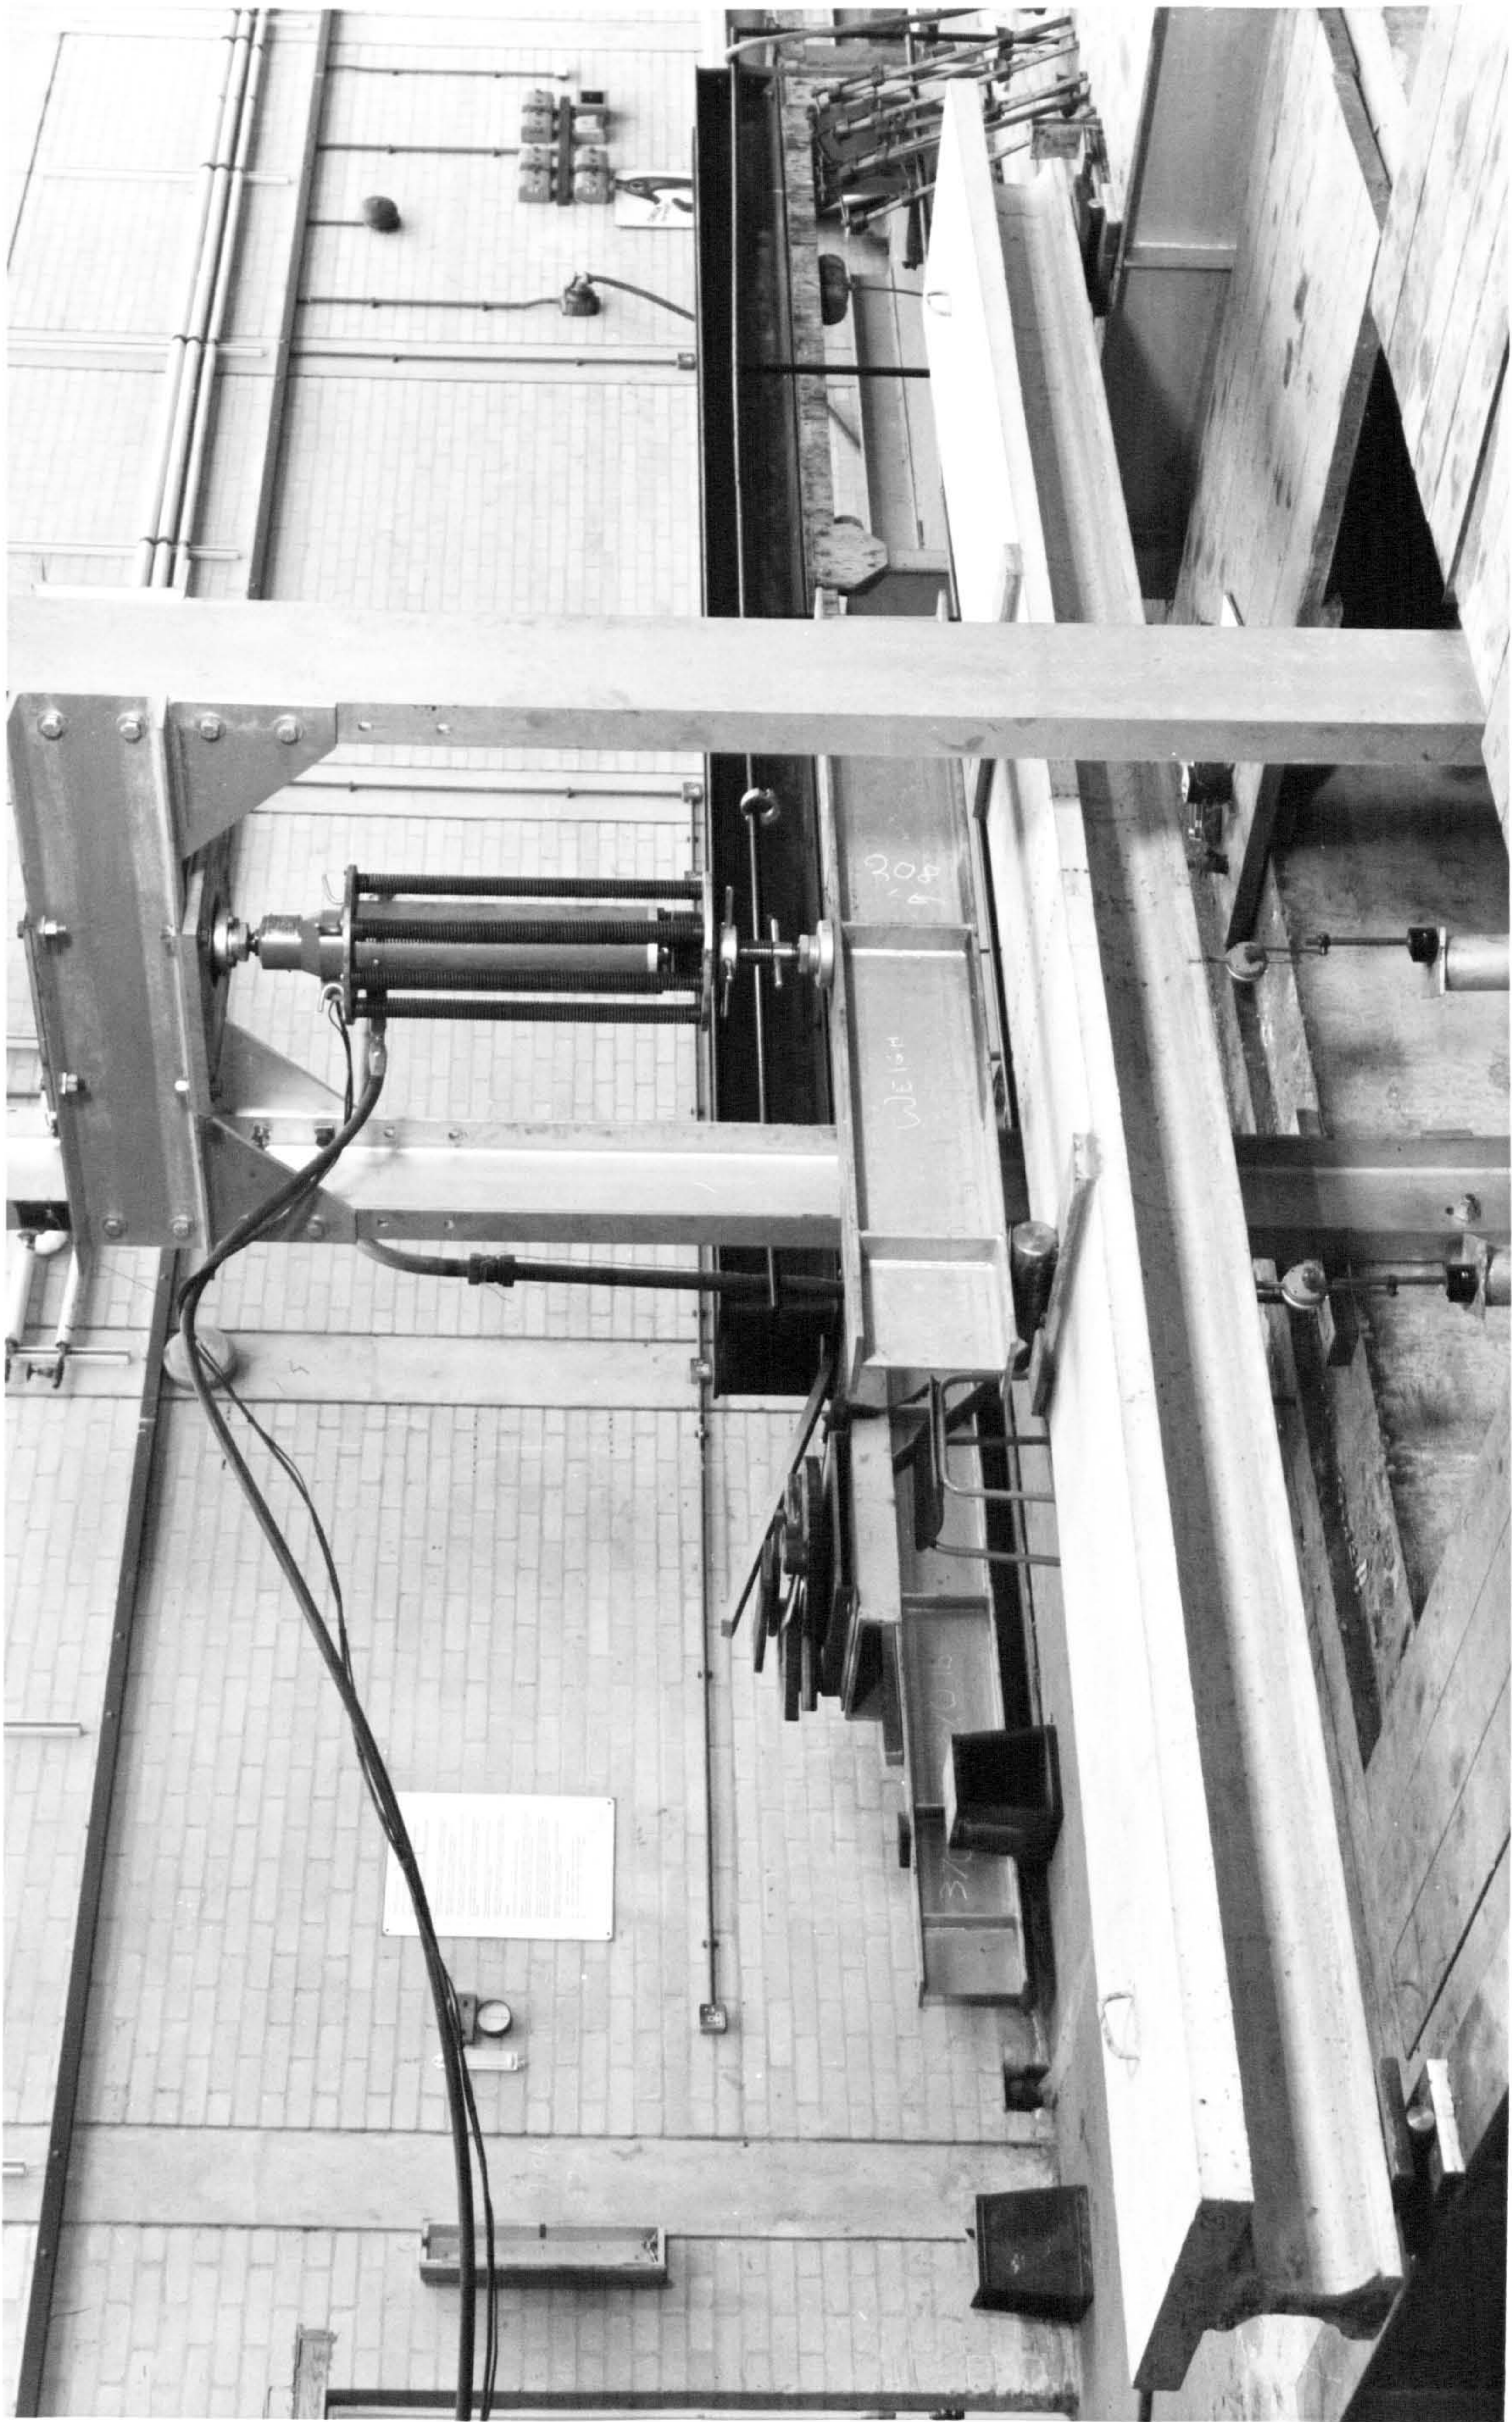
LOADING ARRANGEMENTS FOR SHORT TERM AND FATIGUE TESTS
